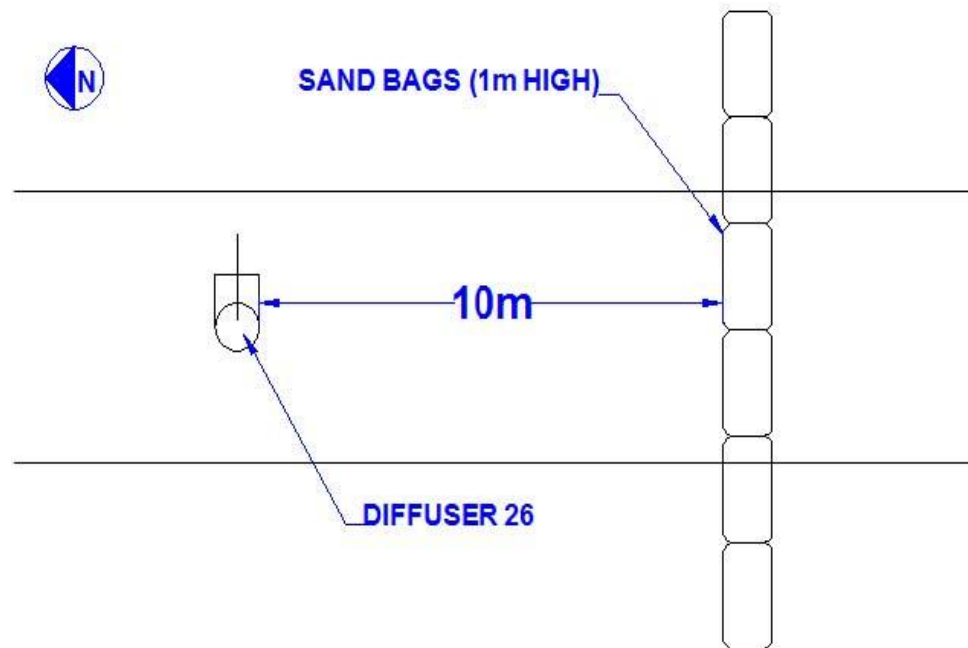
Sand Bag Wall to Protect Overflow Pipe Diffusers
